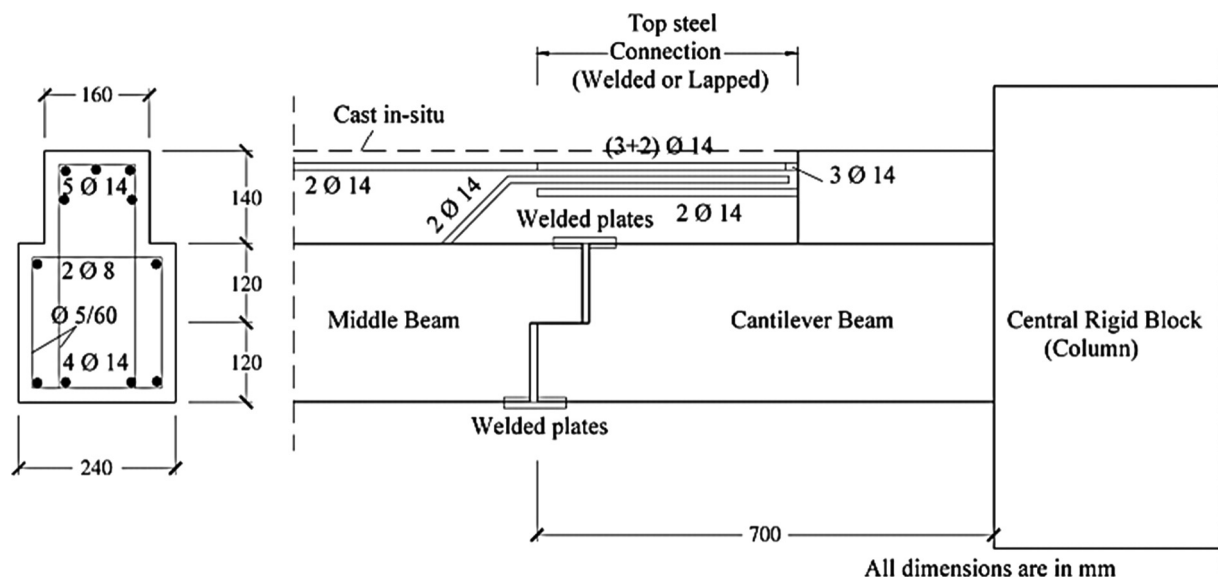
Reinforcement and dimensions of a plate connection [6].
